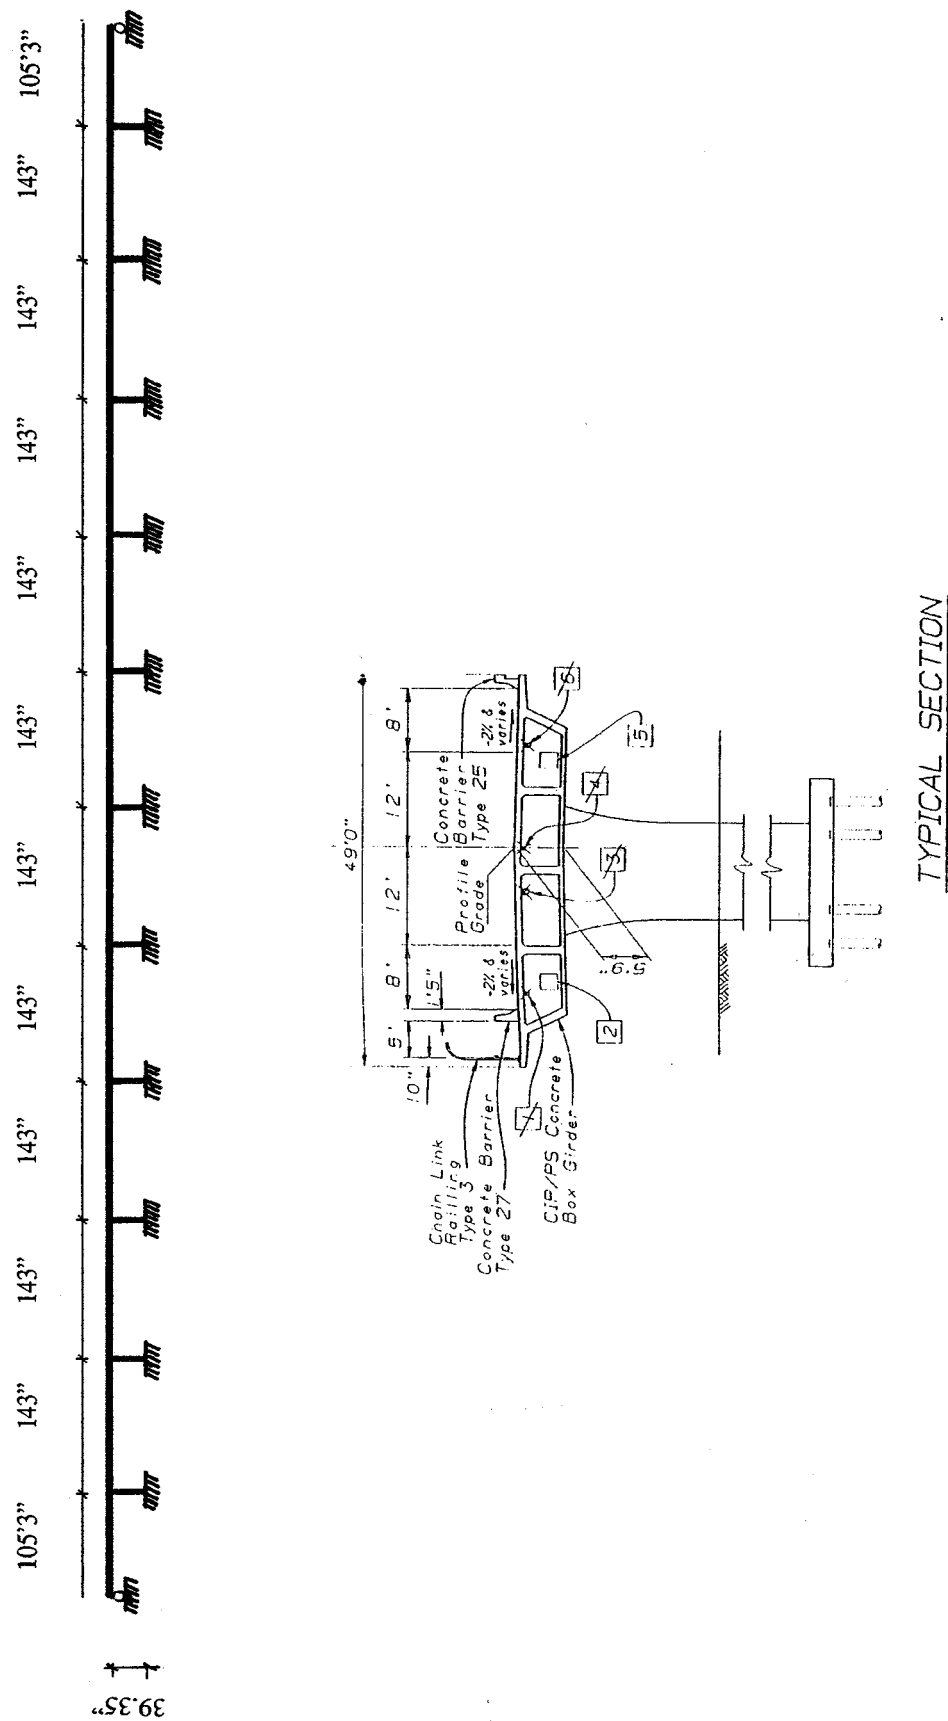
Elevation and Sectional View of Santa Clara Bridge
